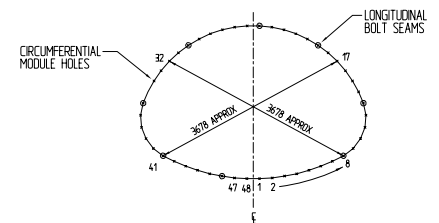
PLATE DETAIL "A" - INSIDE VIEW SCALE 120
